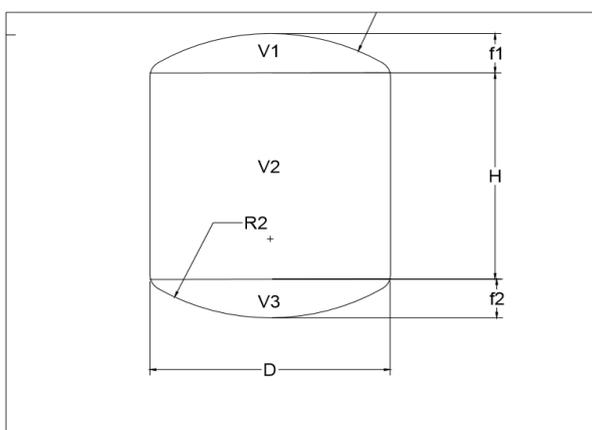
Geometrical Dimensions of Cylindrical Shaped Biogas Digester Body
